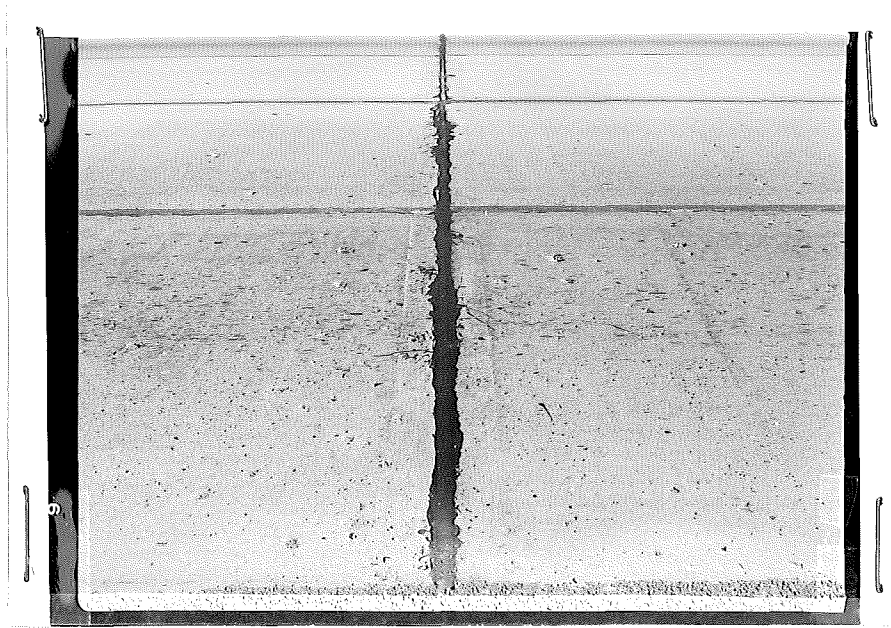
Paraplastic. South half looking north. Station 186+55. Joint properly filled.
